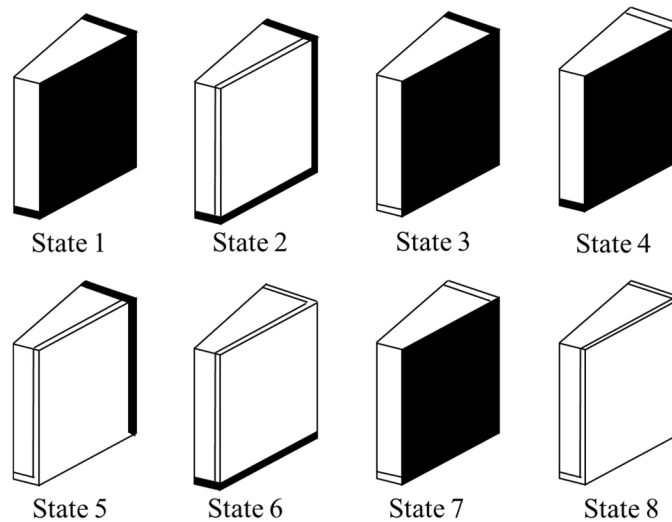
Joint states for the bottom masonry (failed/open joints are in white).
